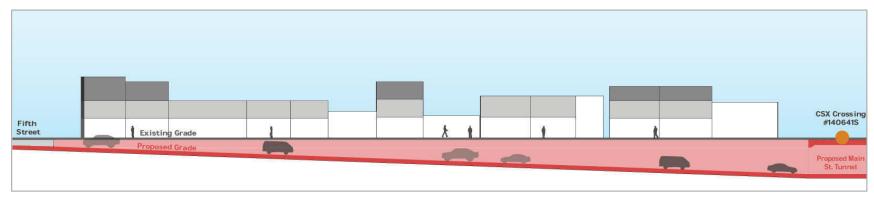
Alternative B Section/Elevation, south facing along 500 block Main Street
